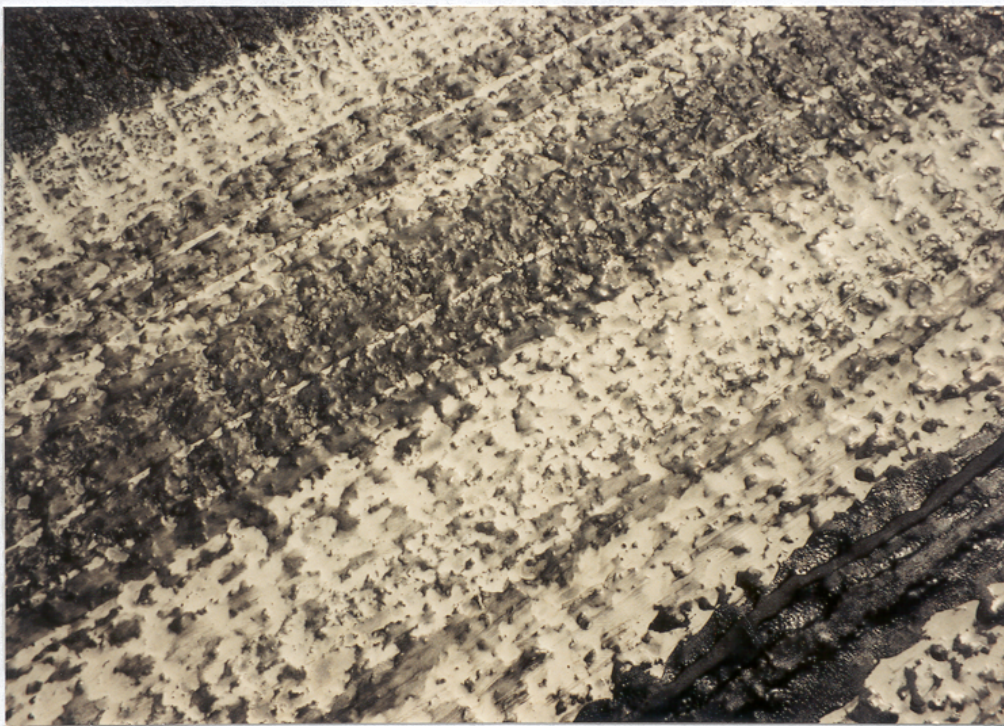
RUBBER BUILDUP ON RUNWAY TEST STRIPE
